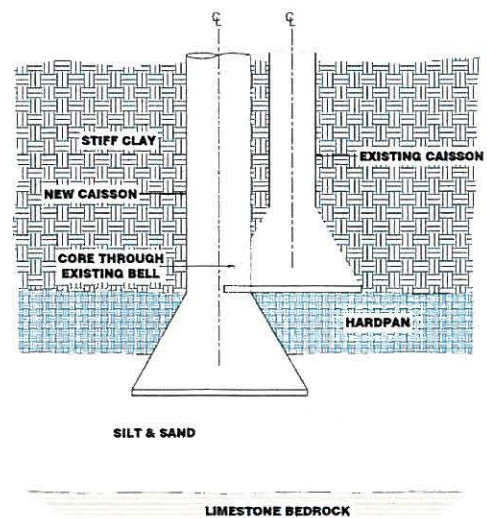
Installation of new caissons below the hardpan and beneath existing abandoned caissons.
